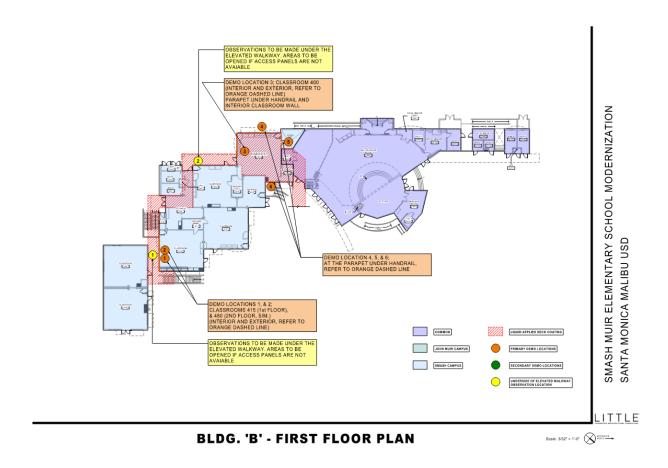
Demo Locations, Bldg B_First Floor Plan_Demo Locations.
